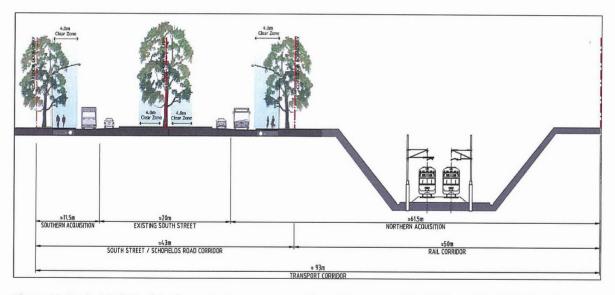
Typical Rail Corridor Cross Section in cutting adjacent to proposed South Street/Schofields Road
